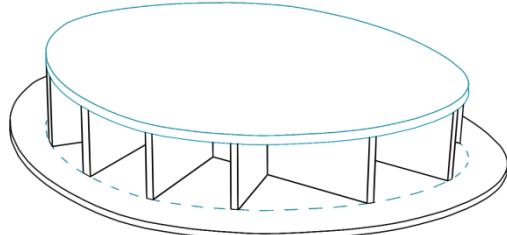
The shape of the roof slab is the same as the one that shapes the interior space, and consequently the walls, of the last floor of the building.
